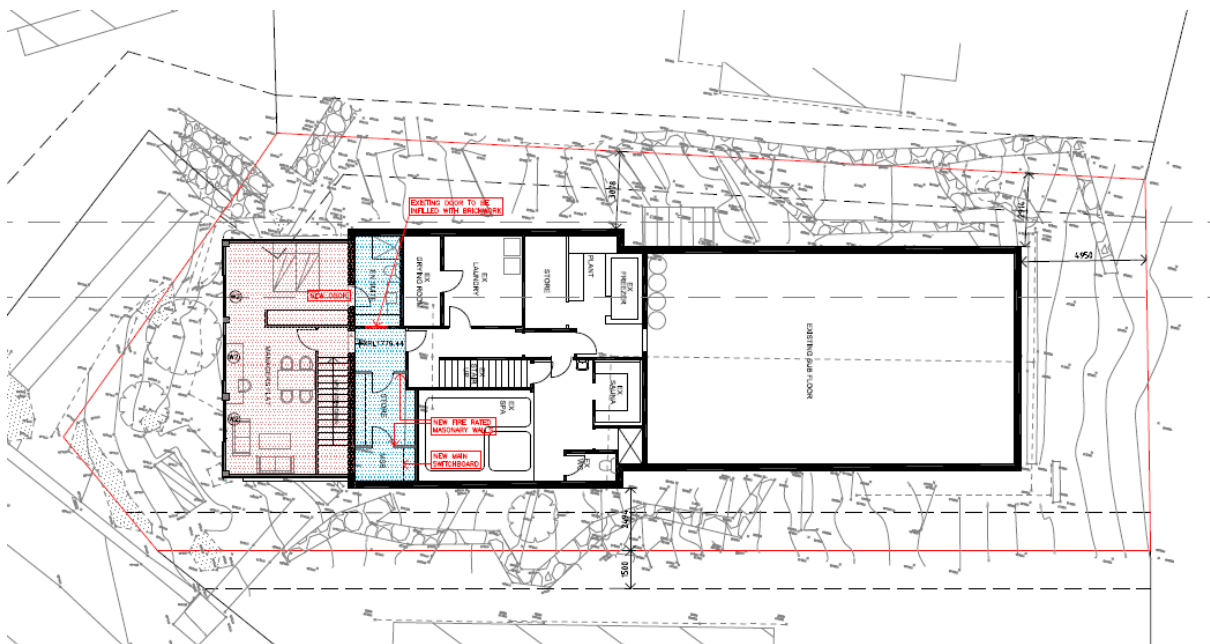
FIRST FLOOR ALTS & ADDS FLOOR PLAN
